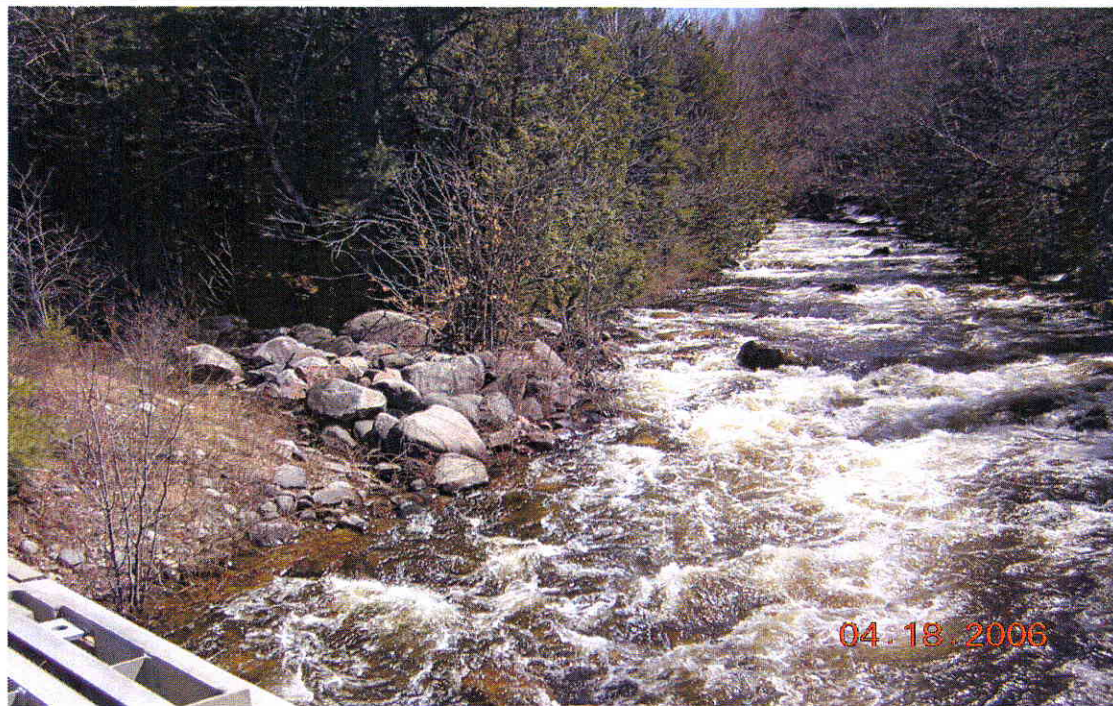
Rapid River upstream, to the east, of the existing bridge.
